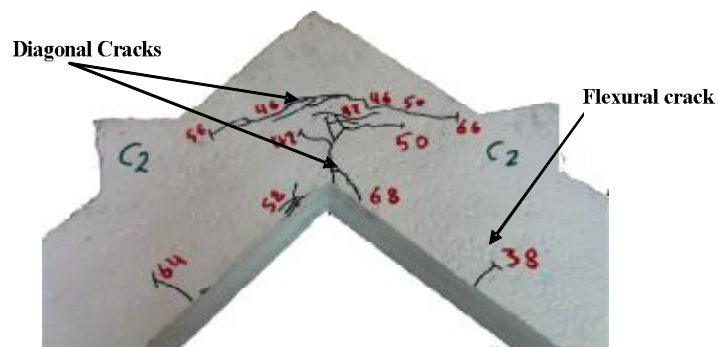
, Cracks Pattern, Cracking Load, Cracks Type
